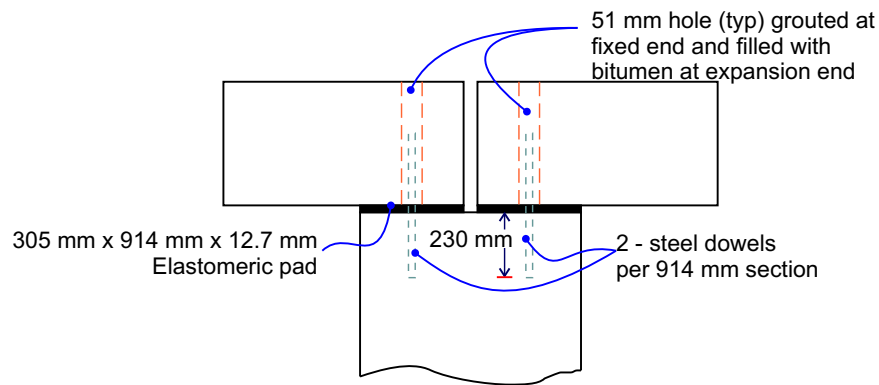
Typical Elastomeric Bearing Used for Concrete-Box Girder and Slab Bridges.
